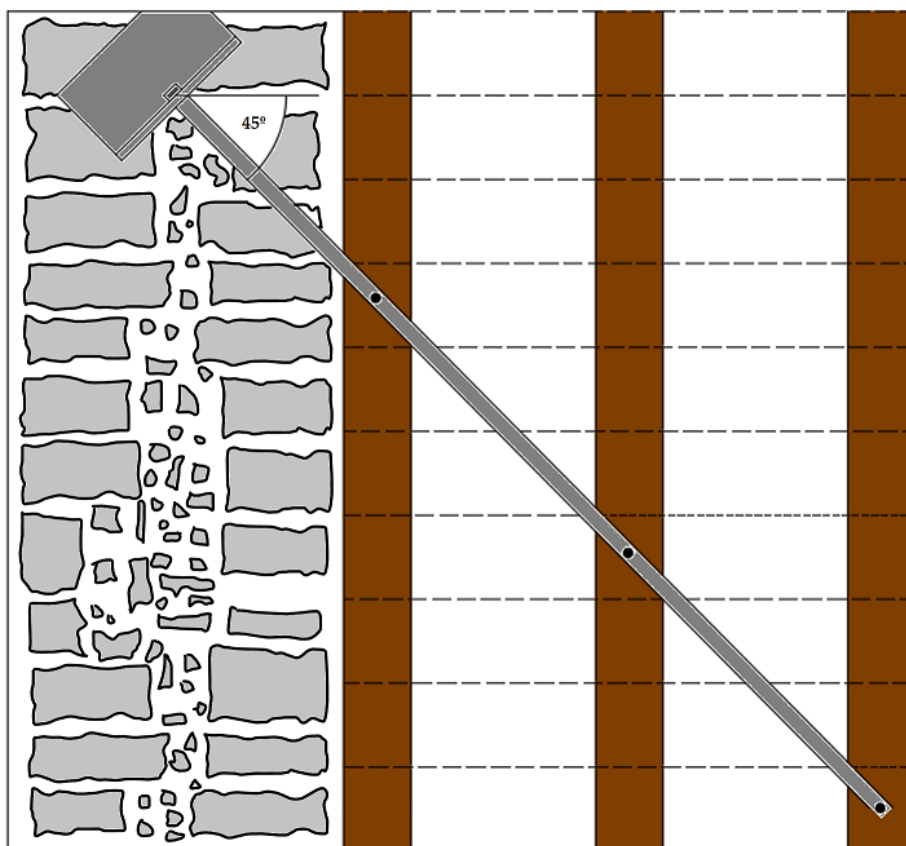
Plan view of reinforced timber floors using the anchoring system of Pombalino buildings.
